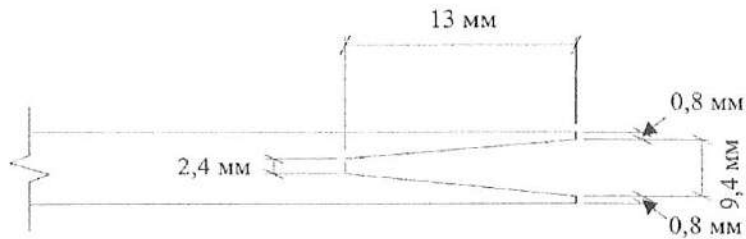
Detail of Sk-beam connection (64x38; 89x38); dimensions in mm
